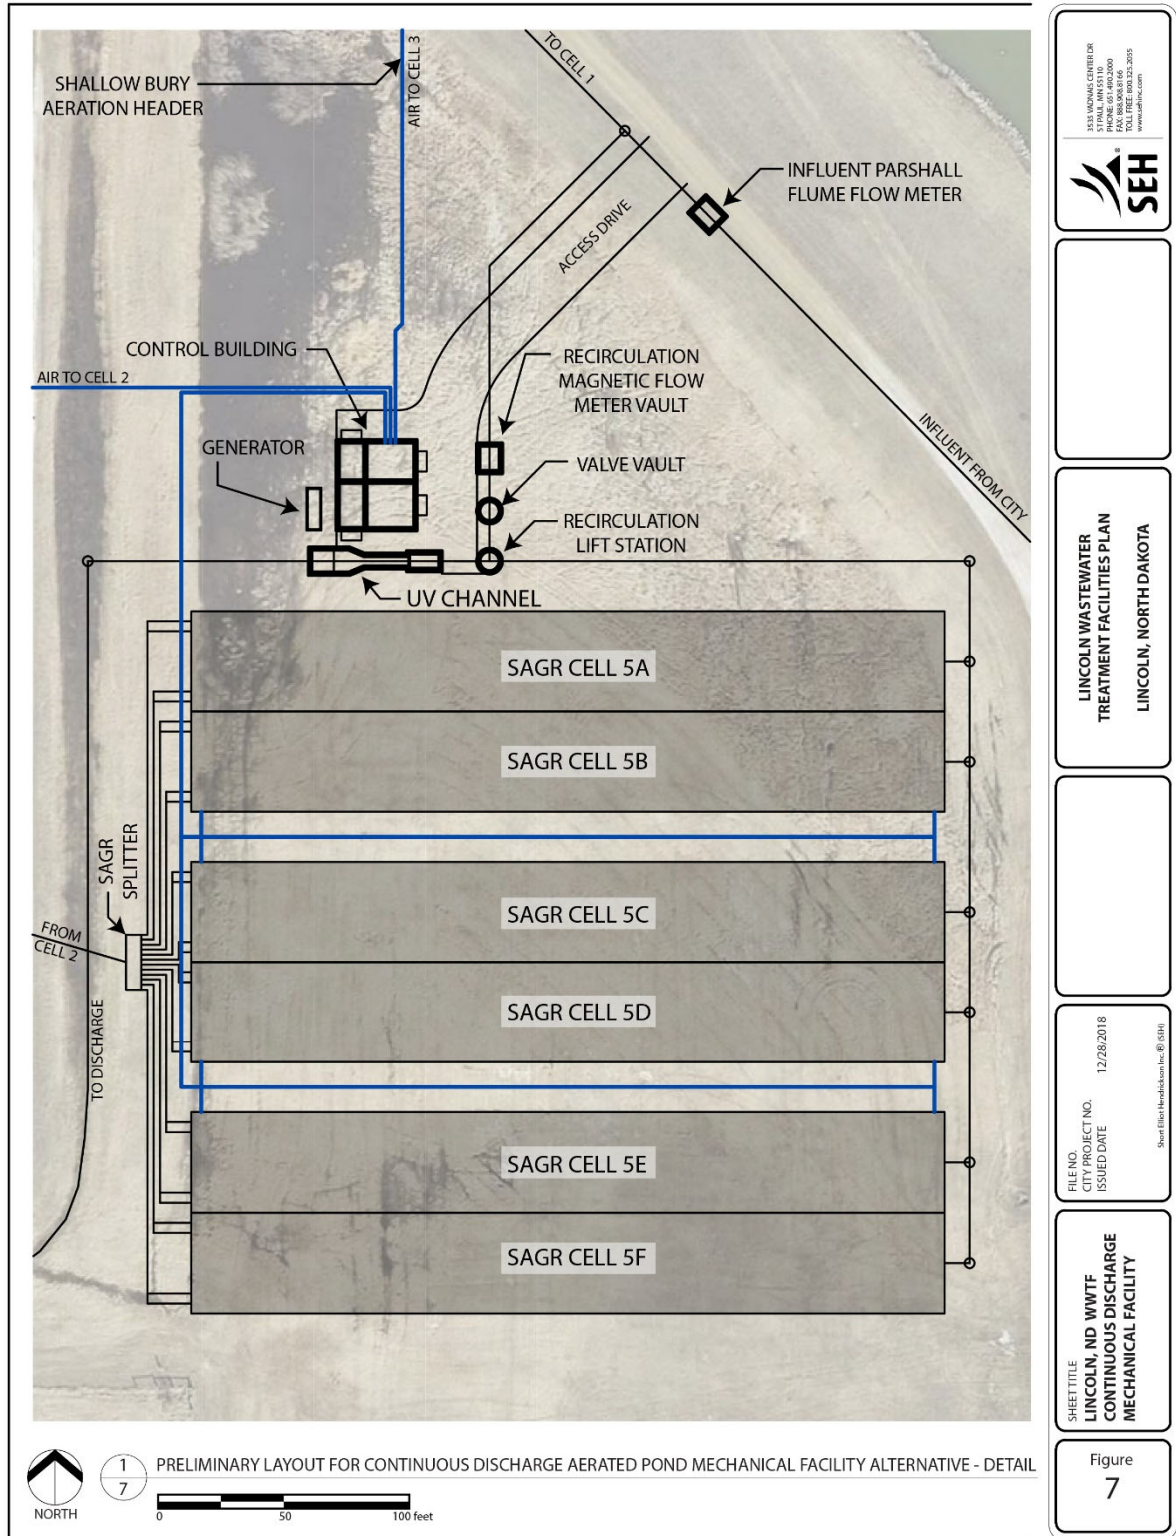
Preliminary Layout for Continuous Discharge Aerated Pond Mechanical Facility Alternative - Detail
